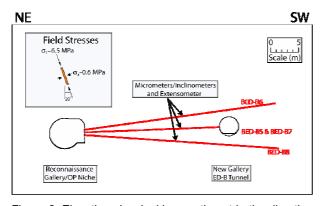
Elevation view looking southeast in the direction of excavation advance.
